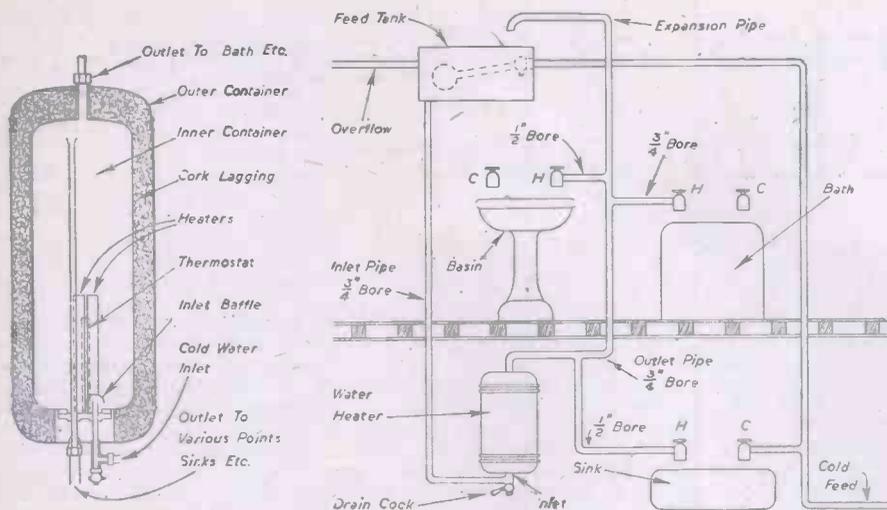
Pressure type water heater for wall fixing. Outlets may be taken either from the top or bottom. This heater must be fed from a ball-valve type of cold water cistern. Outlets are of the closed (tap) type. Floor standing models operate similarly, but the immersion heater is installed horizontally to allow for inspection. Piping arrangements are shown in the diagram on the right.
